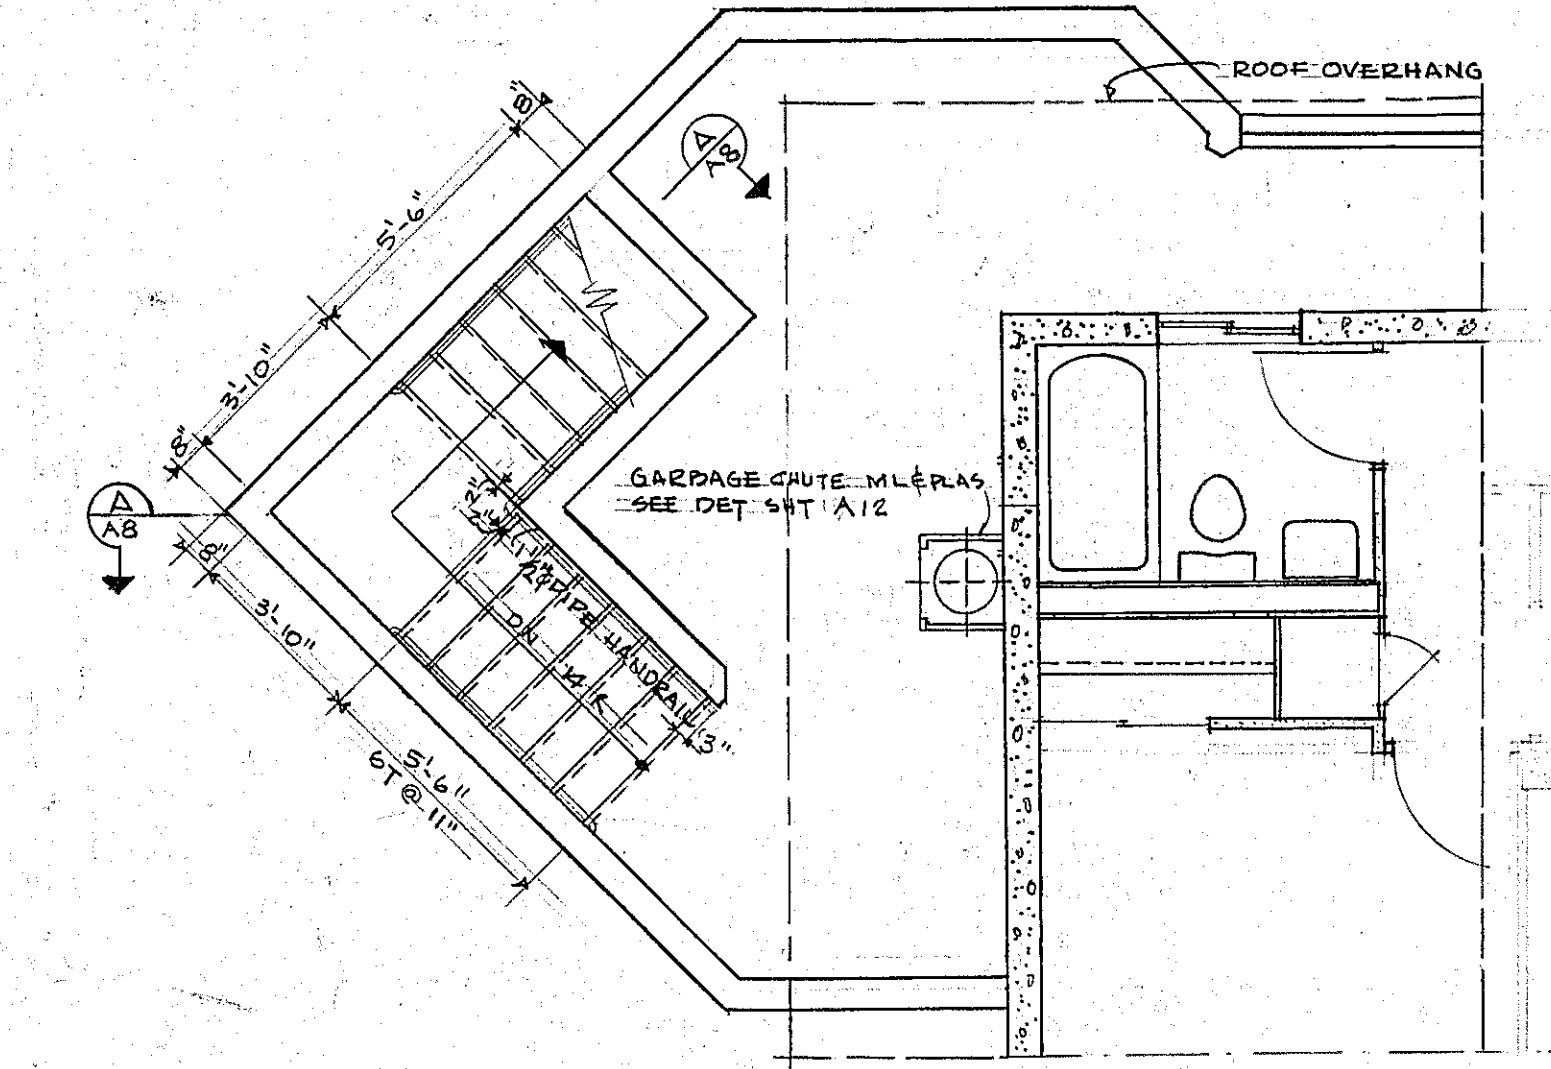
DETAIL PIERCED CONC. PATTERN STAIR NO. 1 3/4" = 1'-0"
